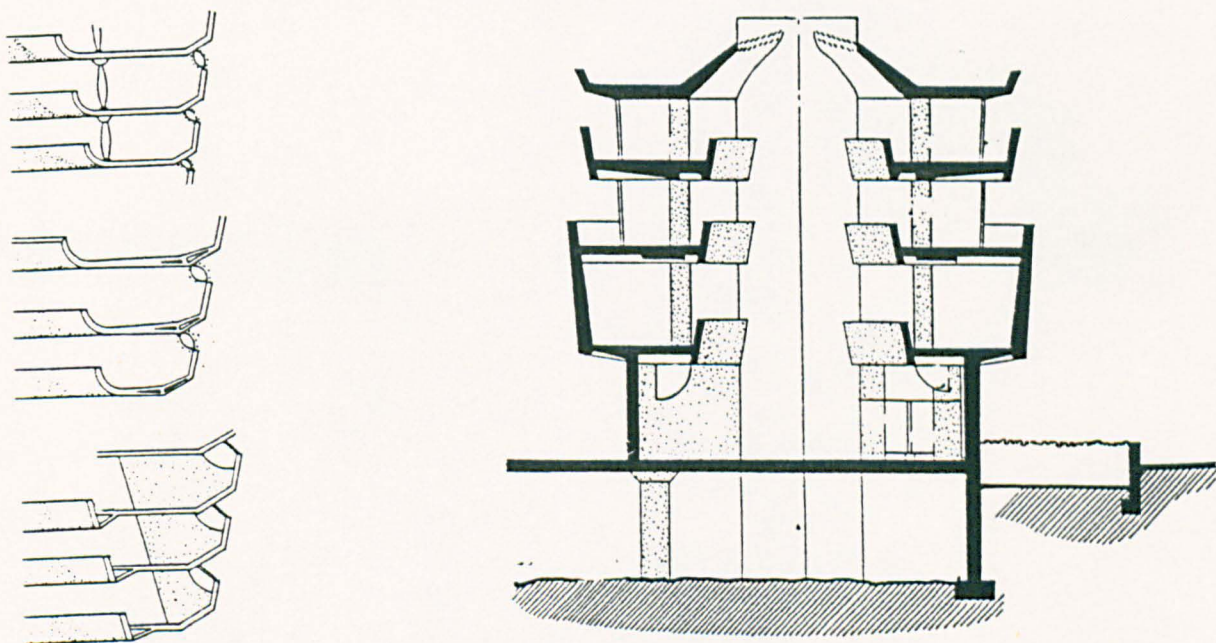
F.L. Wright, Guggenheim Museum, New York (1956-59) Schematic cross section of (right) tower and monitor and, (left) ramp lighting as the concept developed from early stages with columns, top, to the use of 'webs' at bottom, with ductwork carried beneath the ramp, as it was finally built; Wright described 'the outer wall of the spiral, pierced by a continuous light trough cut into the side of the building like a screw thread. This is the source of both natural and artificial illumination.' However, The New York Fire Code prevented the use of glass tubing.
